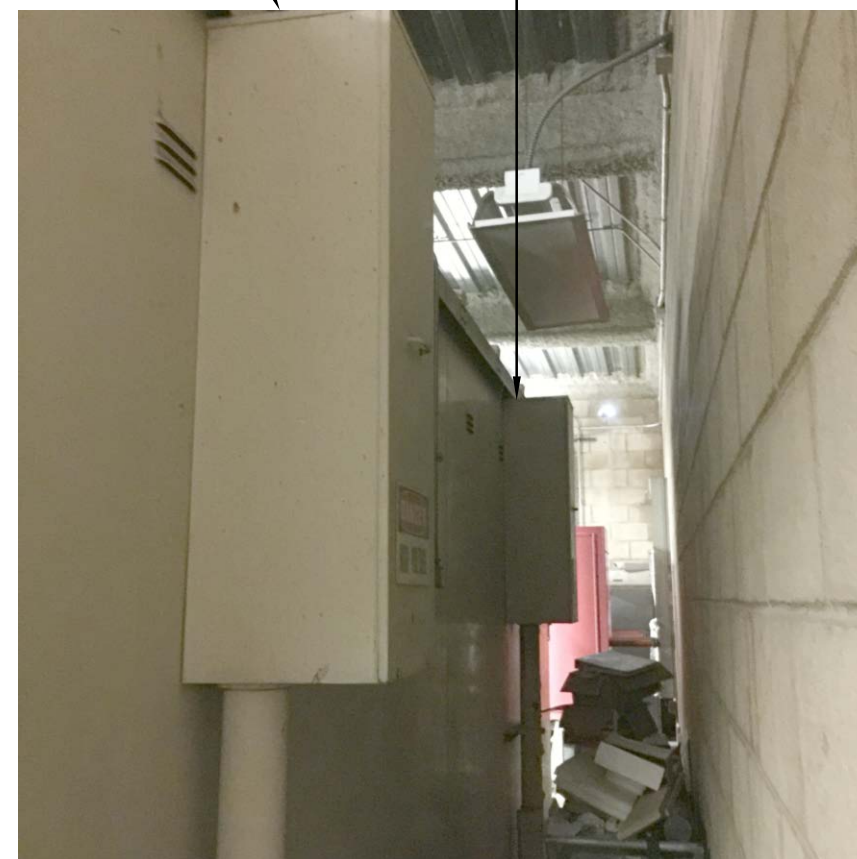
PULL BOXES INSIDE THE ELECTRICAL ROOM IN BUILDING 148.
